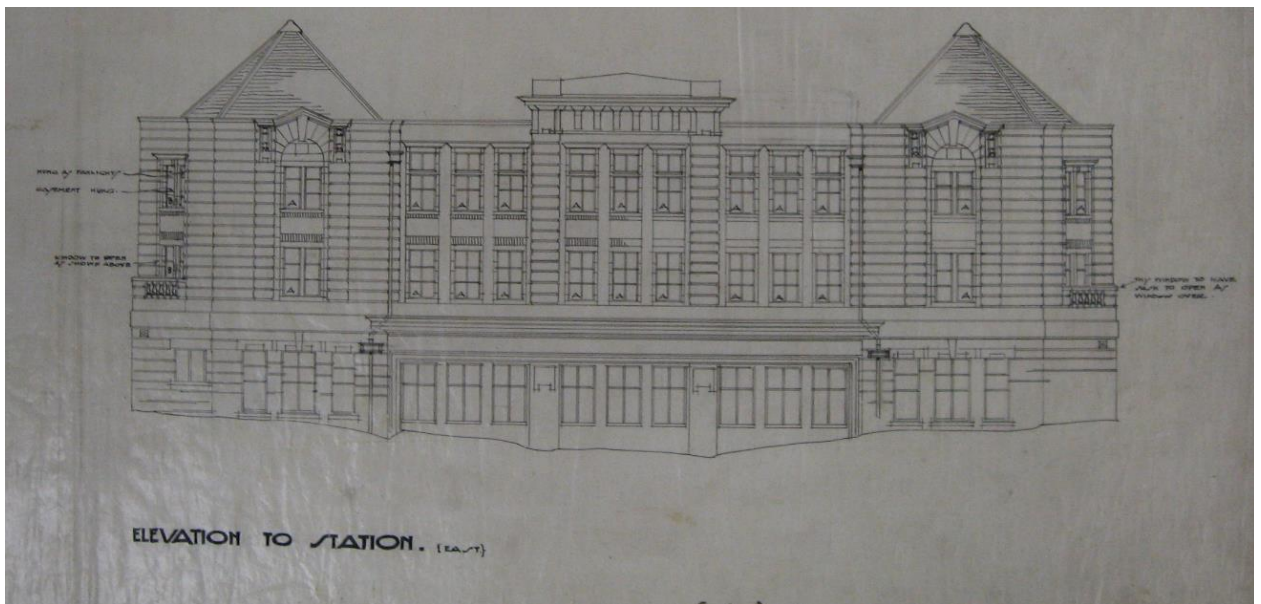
Elevation to Station (east) - Parcels Post Office premises at the Central Railway Station, Sydney. Plans of additional storeys. Sheet 3, 7/5/1912.
